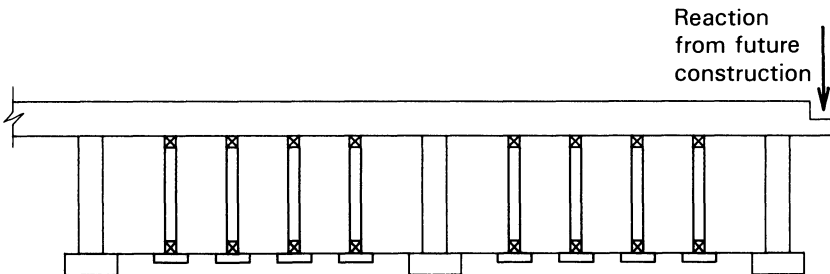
Cast-in-place prestressed-concrete bridge with an in-span hinge or construction joint.
